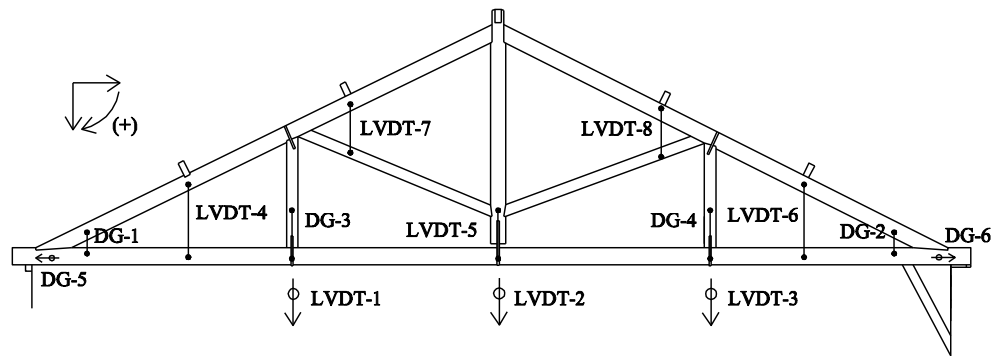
Instrumentation of the tests. Eight LVDTs and six DGs.
